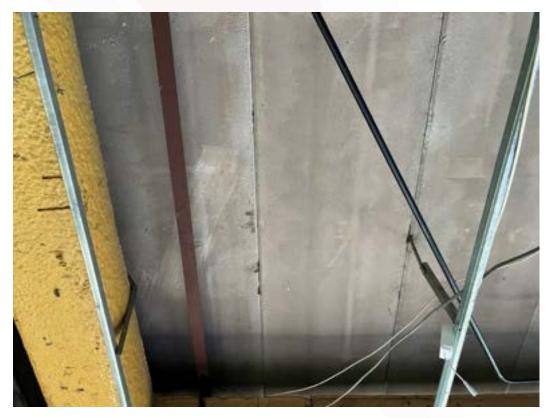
damaged panel adjacent to a cut opening with additional support from timber joist.
